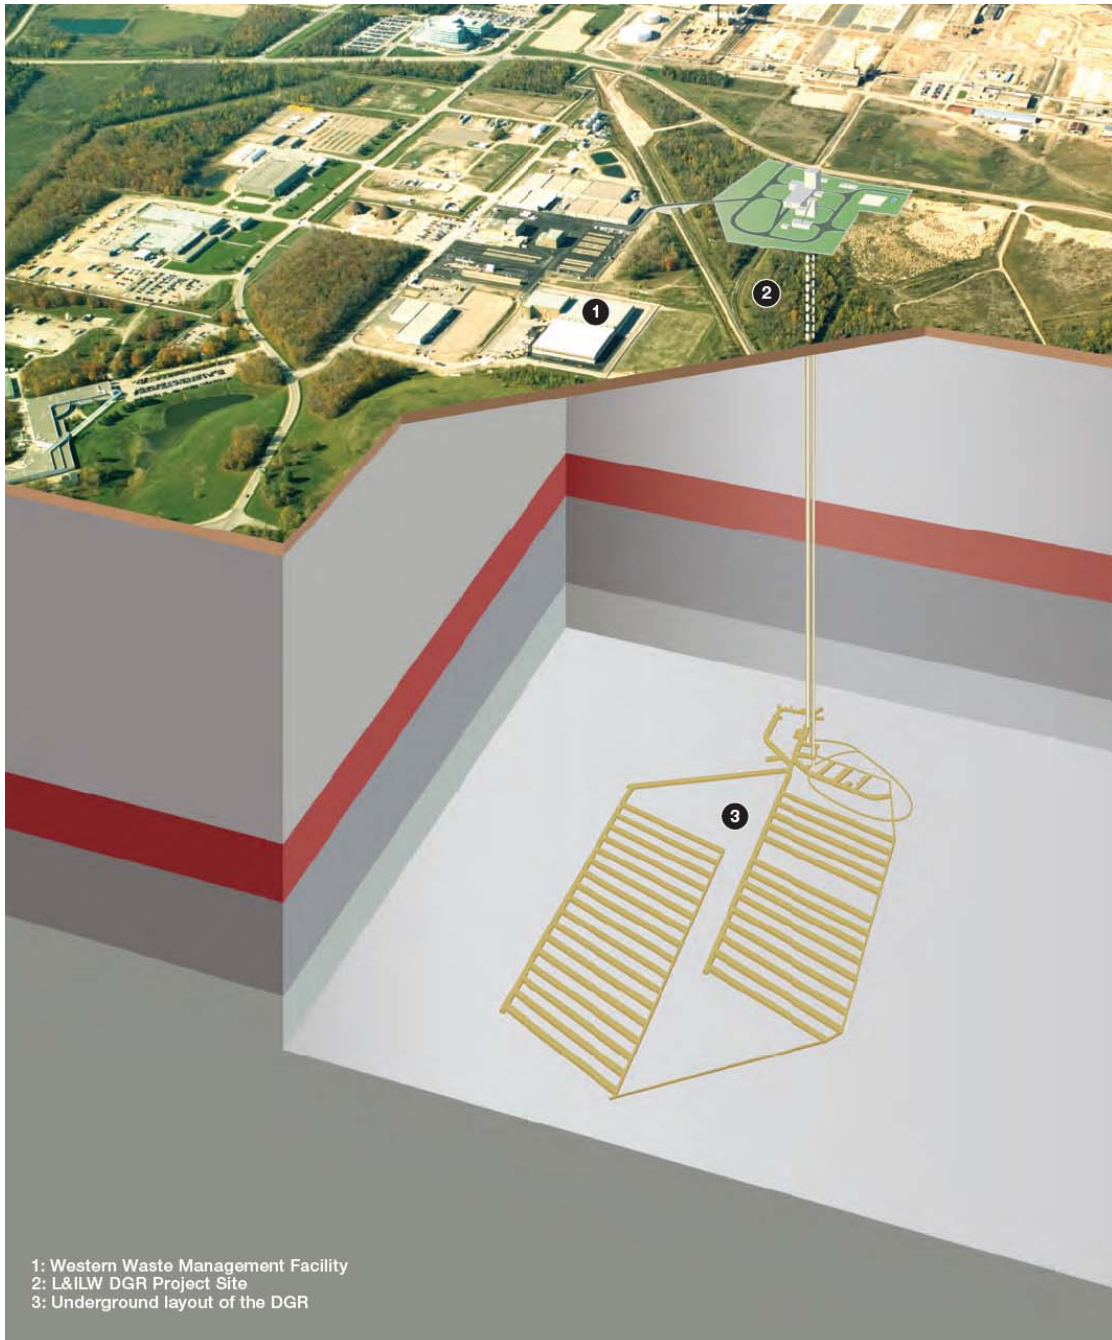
General Arrangement of DGR Site and Surrounding Area (Source: OPG Drawing # 00216-DRAW-00120-10001).
